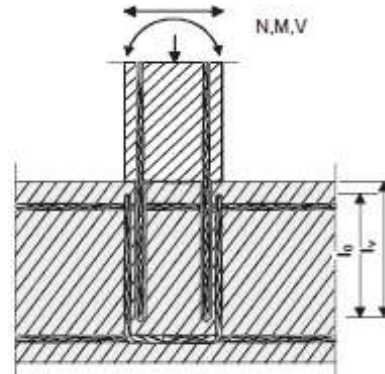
Overlap joint at a foundation of a column or wall where the rebar is stressed in tension
